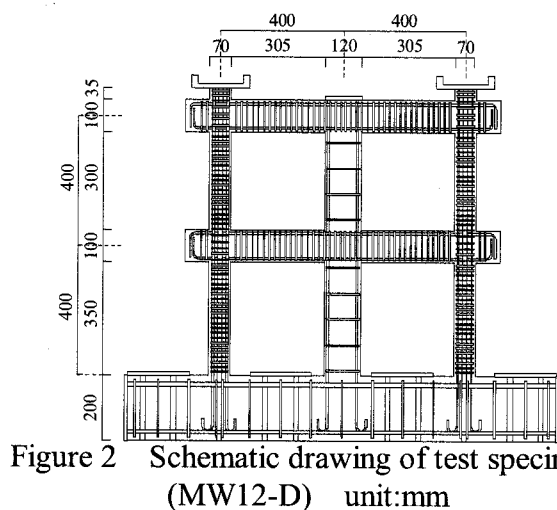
Schematic drawing of test specimen (MW12-D) unit:mm
